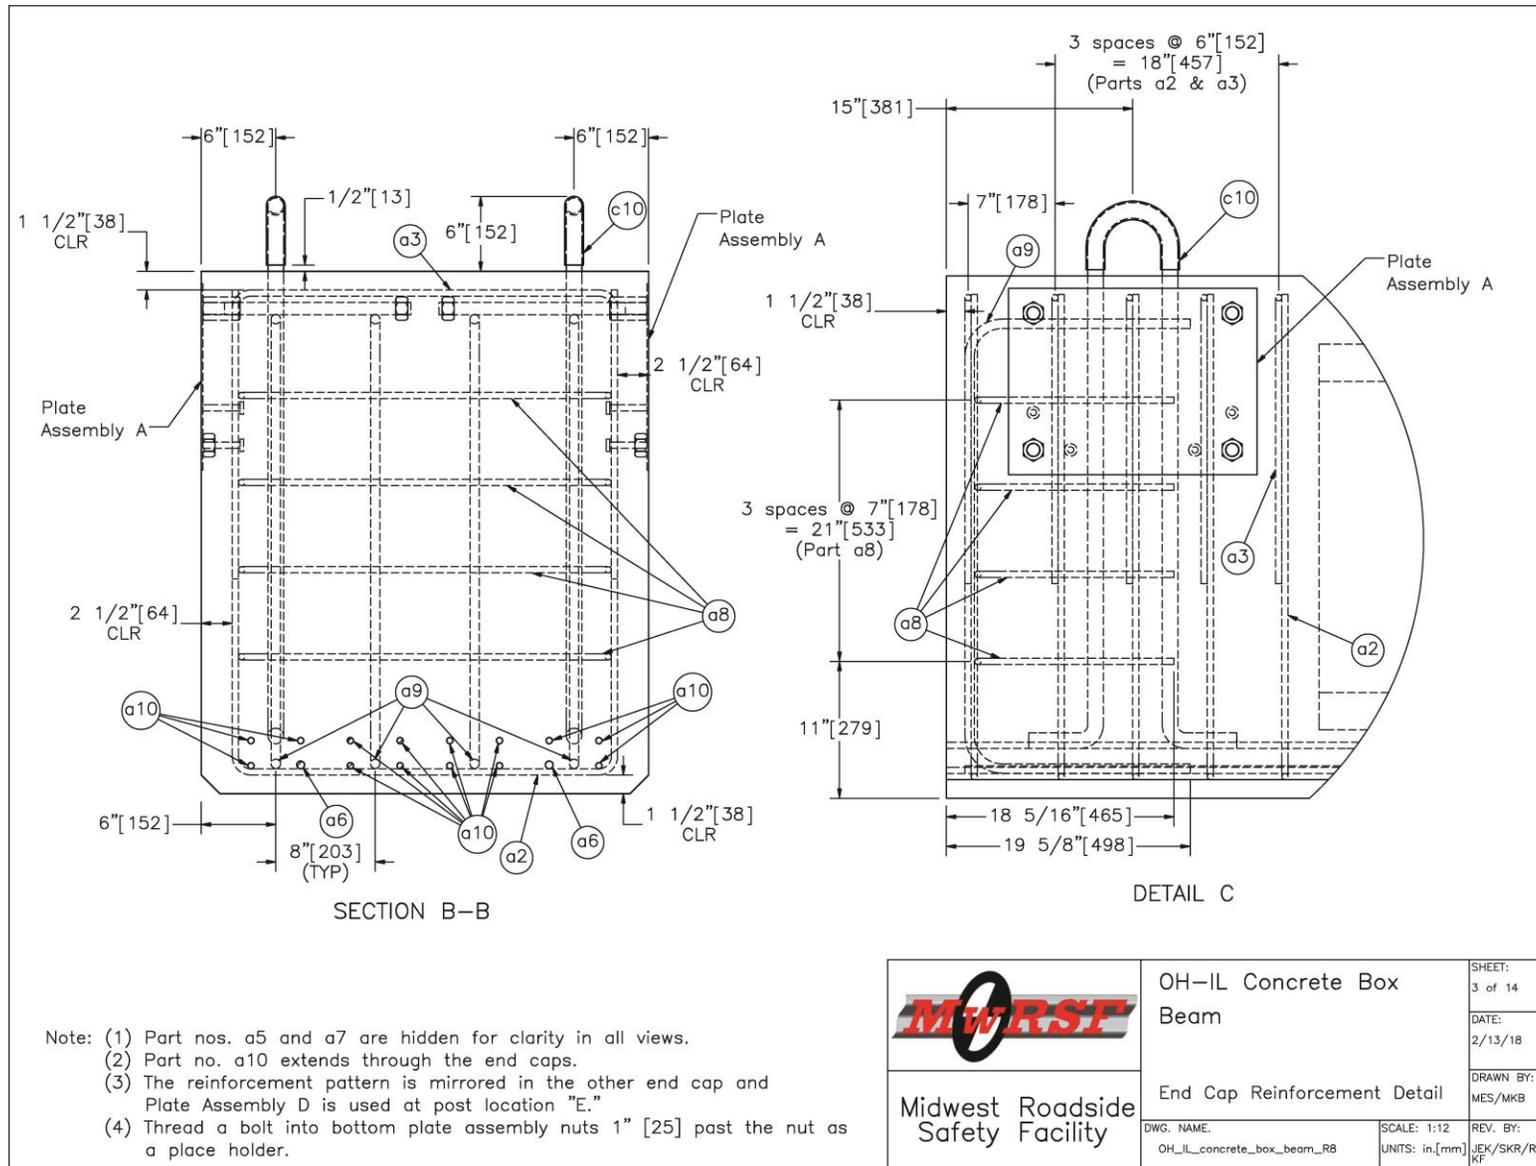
Critical Box-Beam Girder Reinforcement Details for End Cap Sections
